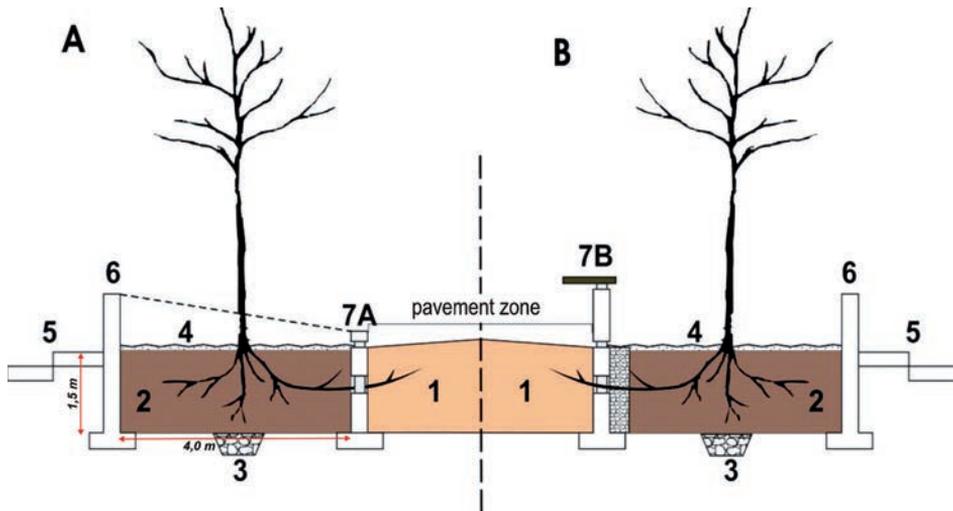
Application of technogenic structural soil for construction of tree wells and pavements – a tree well with a high edge from the road side [A], a tree well with a high edge connected with site furnishings [B] after Borowski et al. (2005, modified). Explanations: 1 – structural soil; 2 – soil; 3 – drainage; 4 – mulch; 5 – curb and road surface; 6 – edge of a tree well ca 40 cm below the ground; 7A – edge of a tree well with a perforated wall from the road side allowing for water run-off towards a tree; 7B – edge of a tree well – ca 40 cm above the ground connected with site furnishings e. g. bench; 8 – edge of a tree well allowing for water run-off from a pavement
